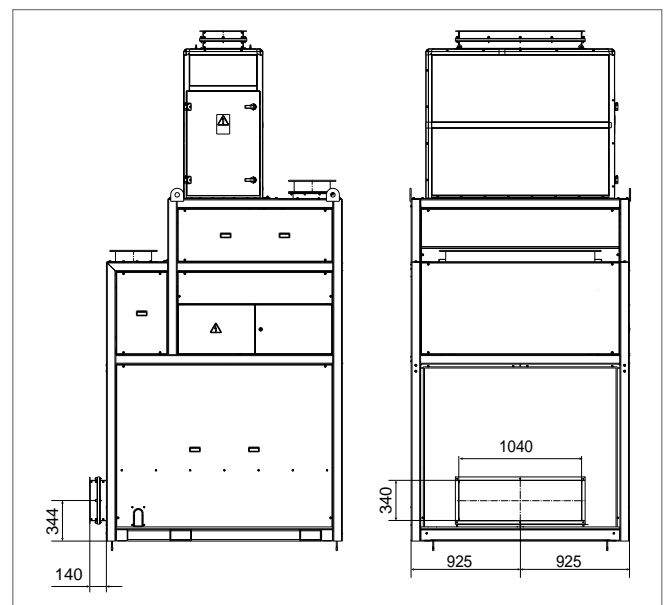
Dimensional drawing for supply air duct connection on left (dimensions in mm)
